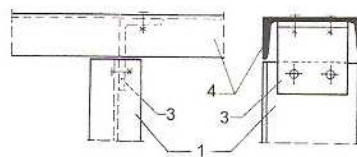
Wall girt to hot-rolled secondary column connection: 1- secondary column, 2- wall girt, 3- angle, 4- eave wall girt
